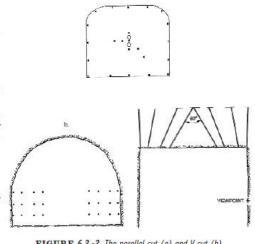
2. The parallel cut (a) and V cut (b).
